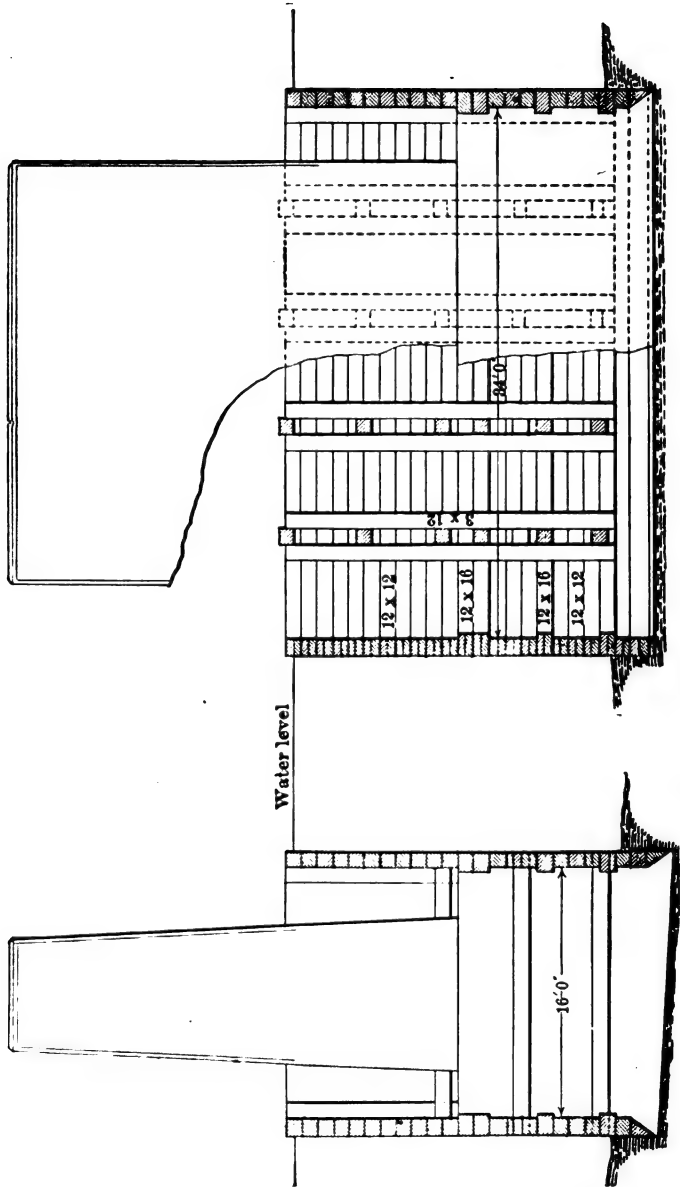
ARNPRIOR BRIDGE, CRIB AND COFFER-DAM.
